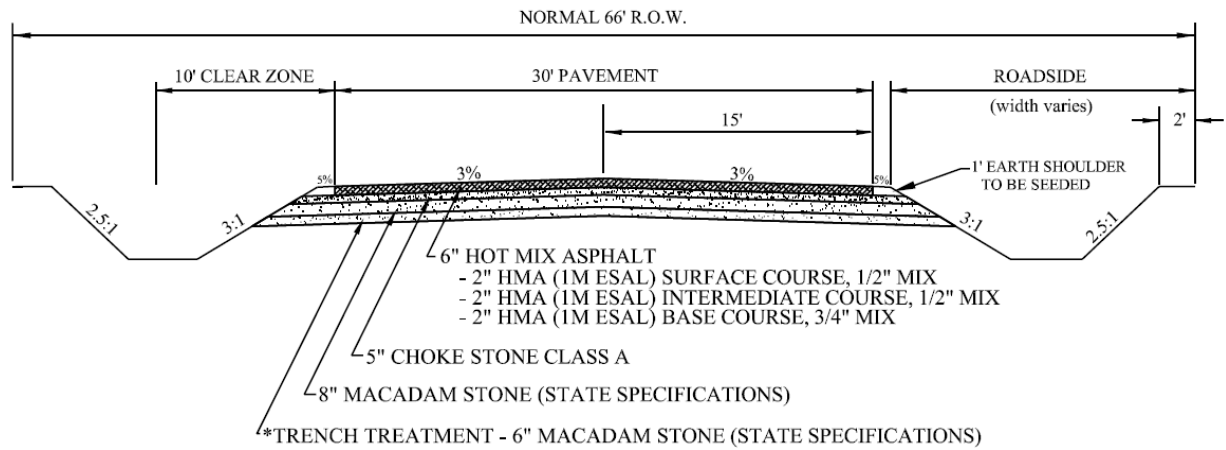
TYPICAL MINIMUM H.M.A. PAVEMENT, MACADAM STONE BASE - OPEN DITCH SECTION
